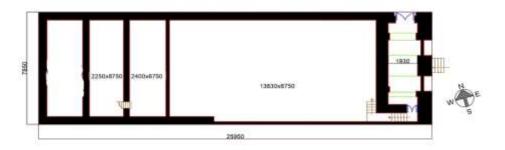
Basement Floor Plan of Vernacular Haveli VH1 Source: Author
